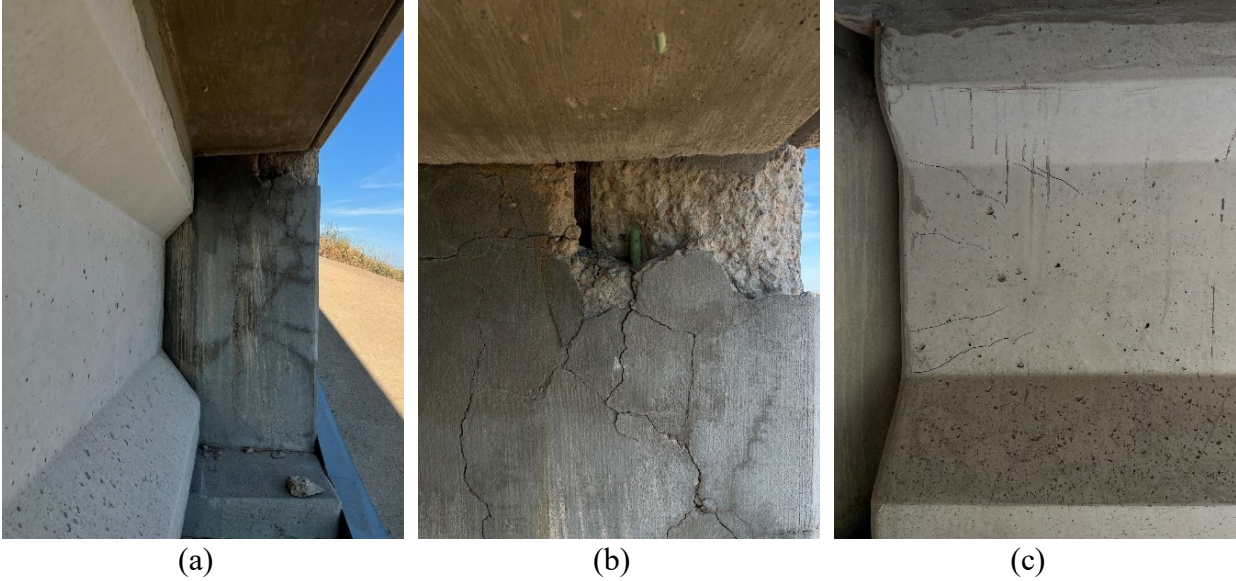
Deteriorations on the Bridge: (a) Severe Cracks and Corroded Rebar On the abutment; (b) Spalling at abutment and Exposed, Corroded Rebar; (c) Hairline Diagonal Cracking on the Web of Girder
